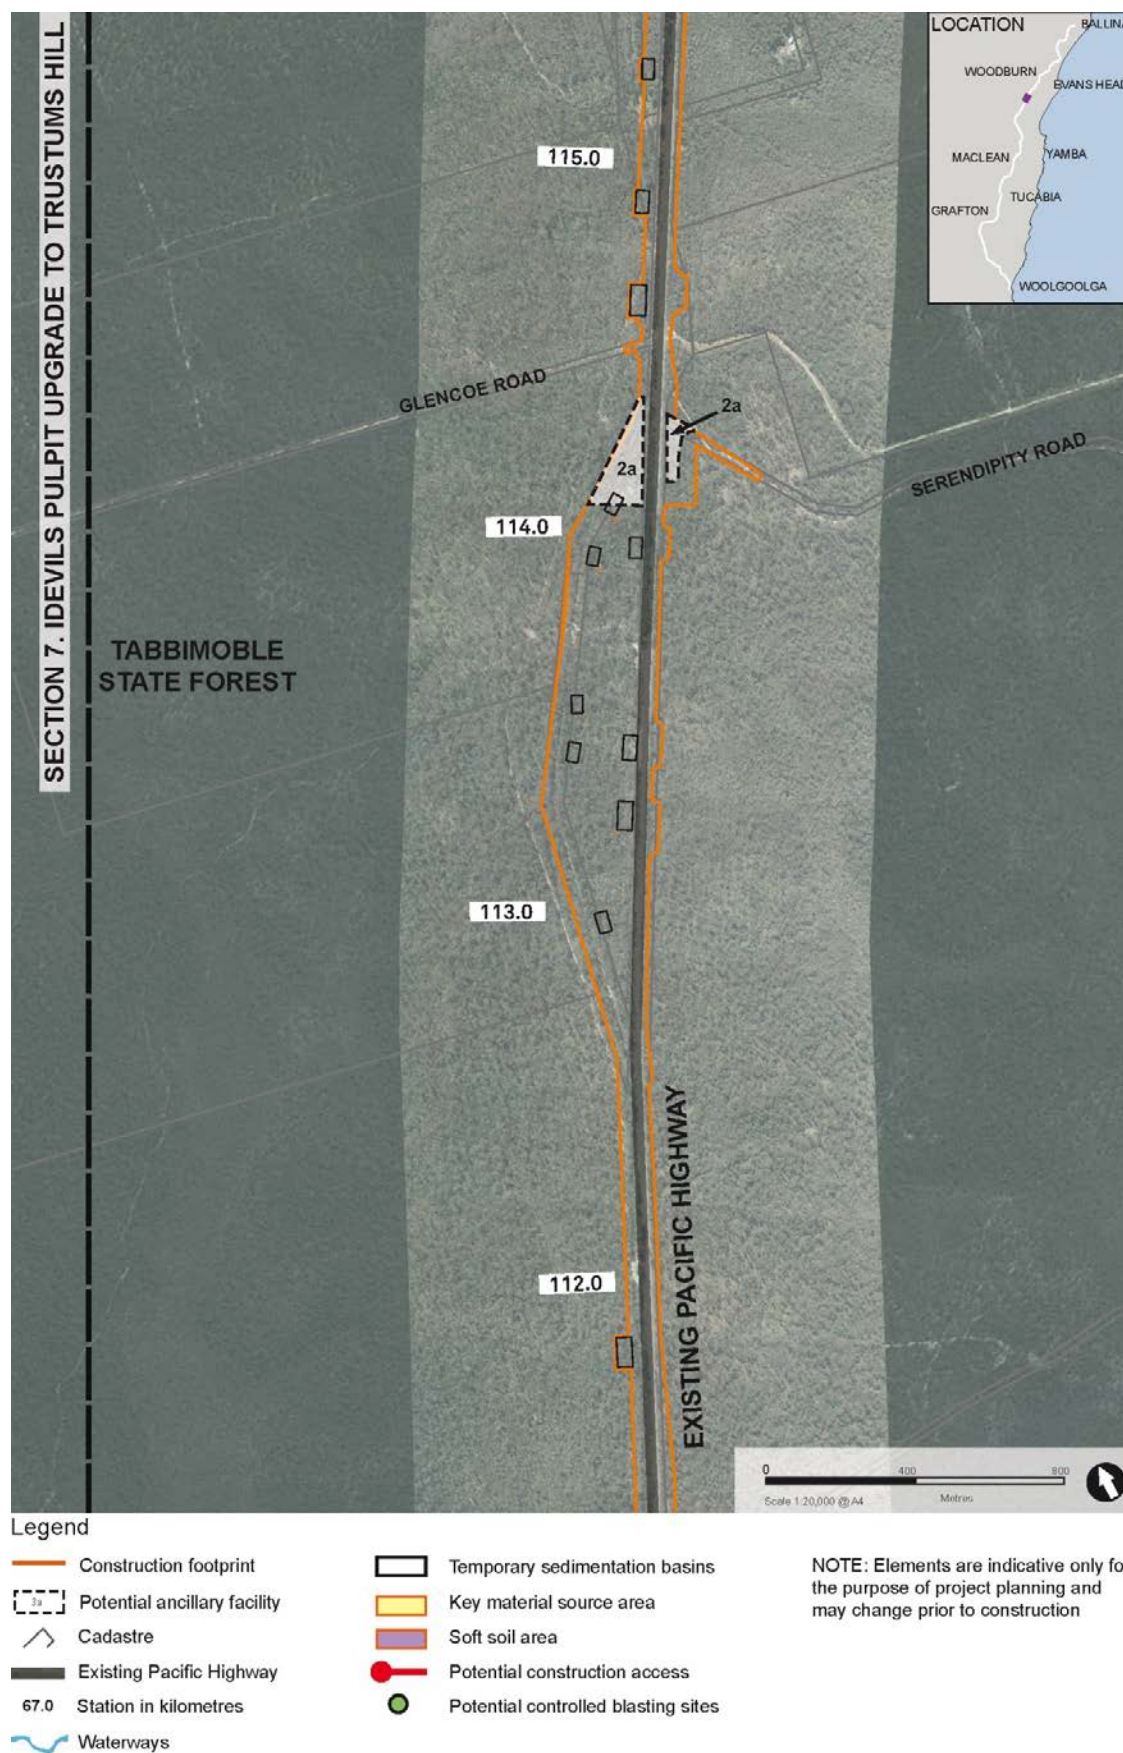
Extent of construction and construction features Section 7 (Station 111.4 to 115.3)
